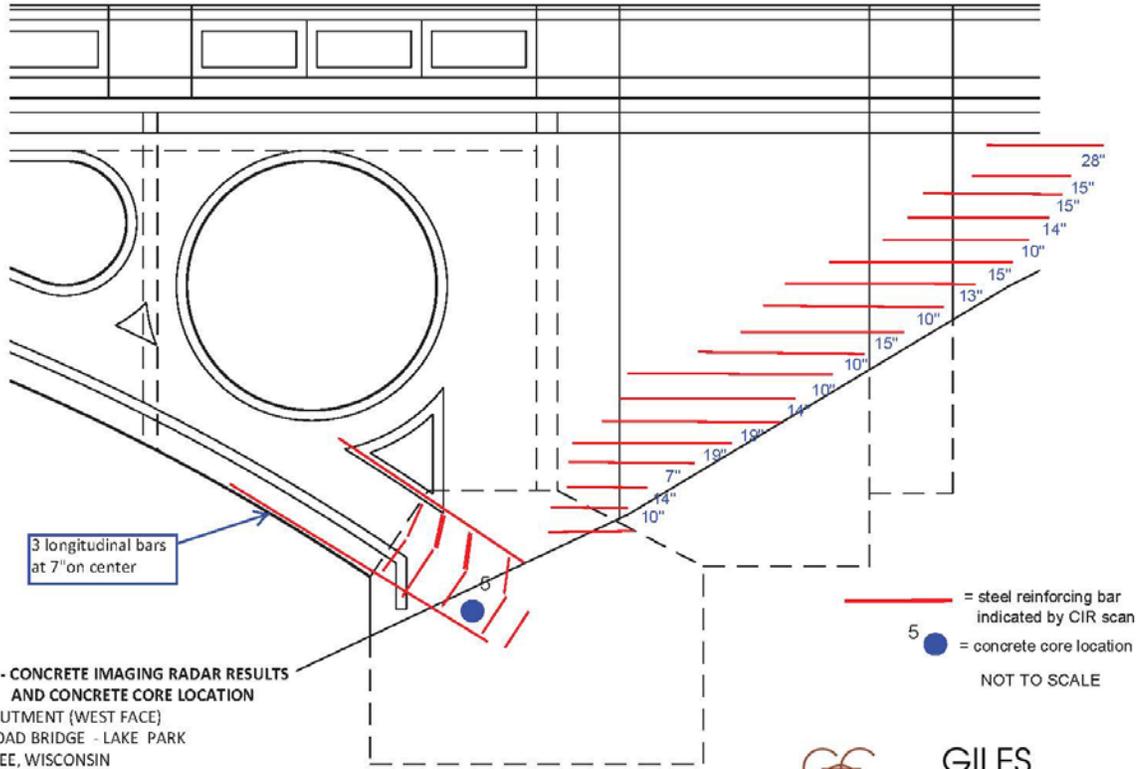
CONCRETE IMAGING RADAR RESULTS AND CONCRETE CORE LOCATION
